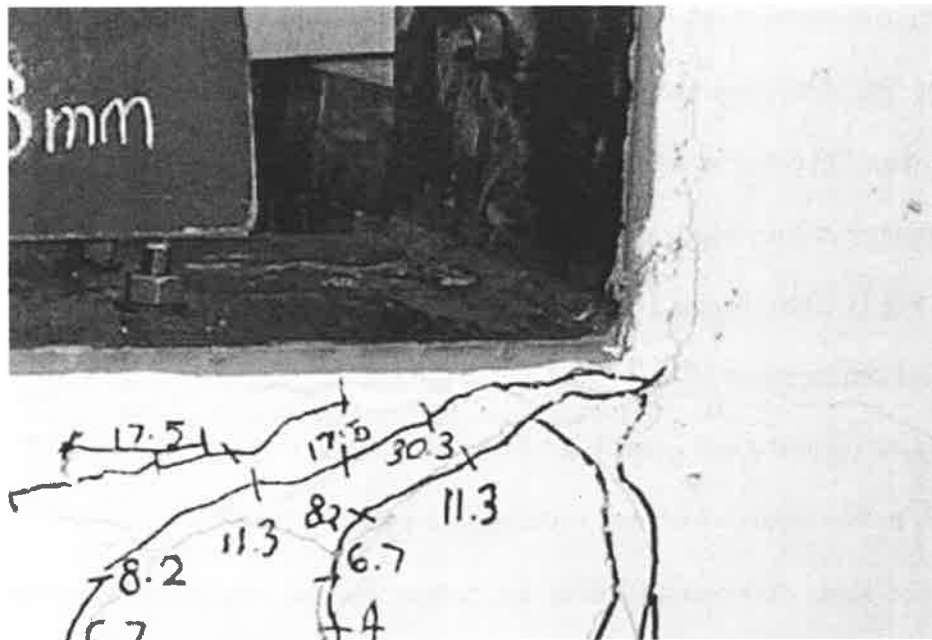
Enlarged view of corner for specimen 2AMF12
